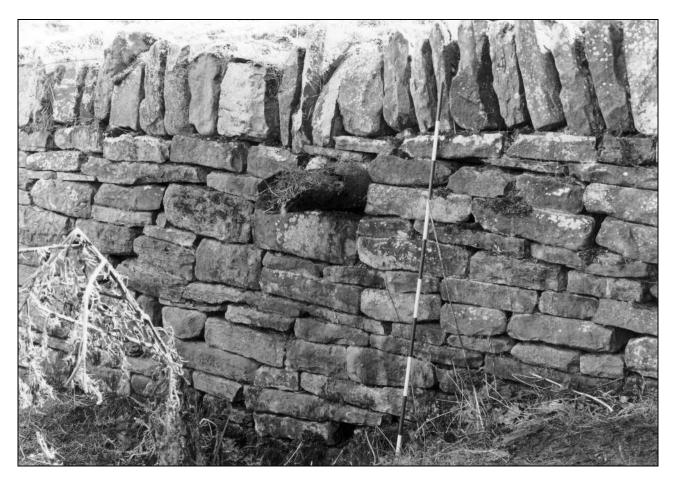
Cast iron water pipe emerging from south retaining wall to east of building 1b, from the north (film 4, frame 17)
